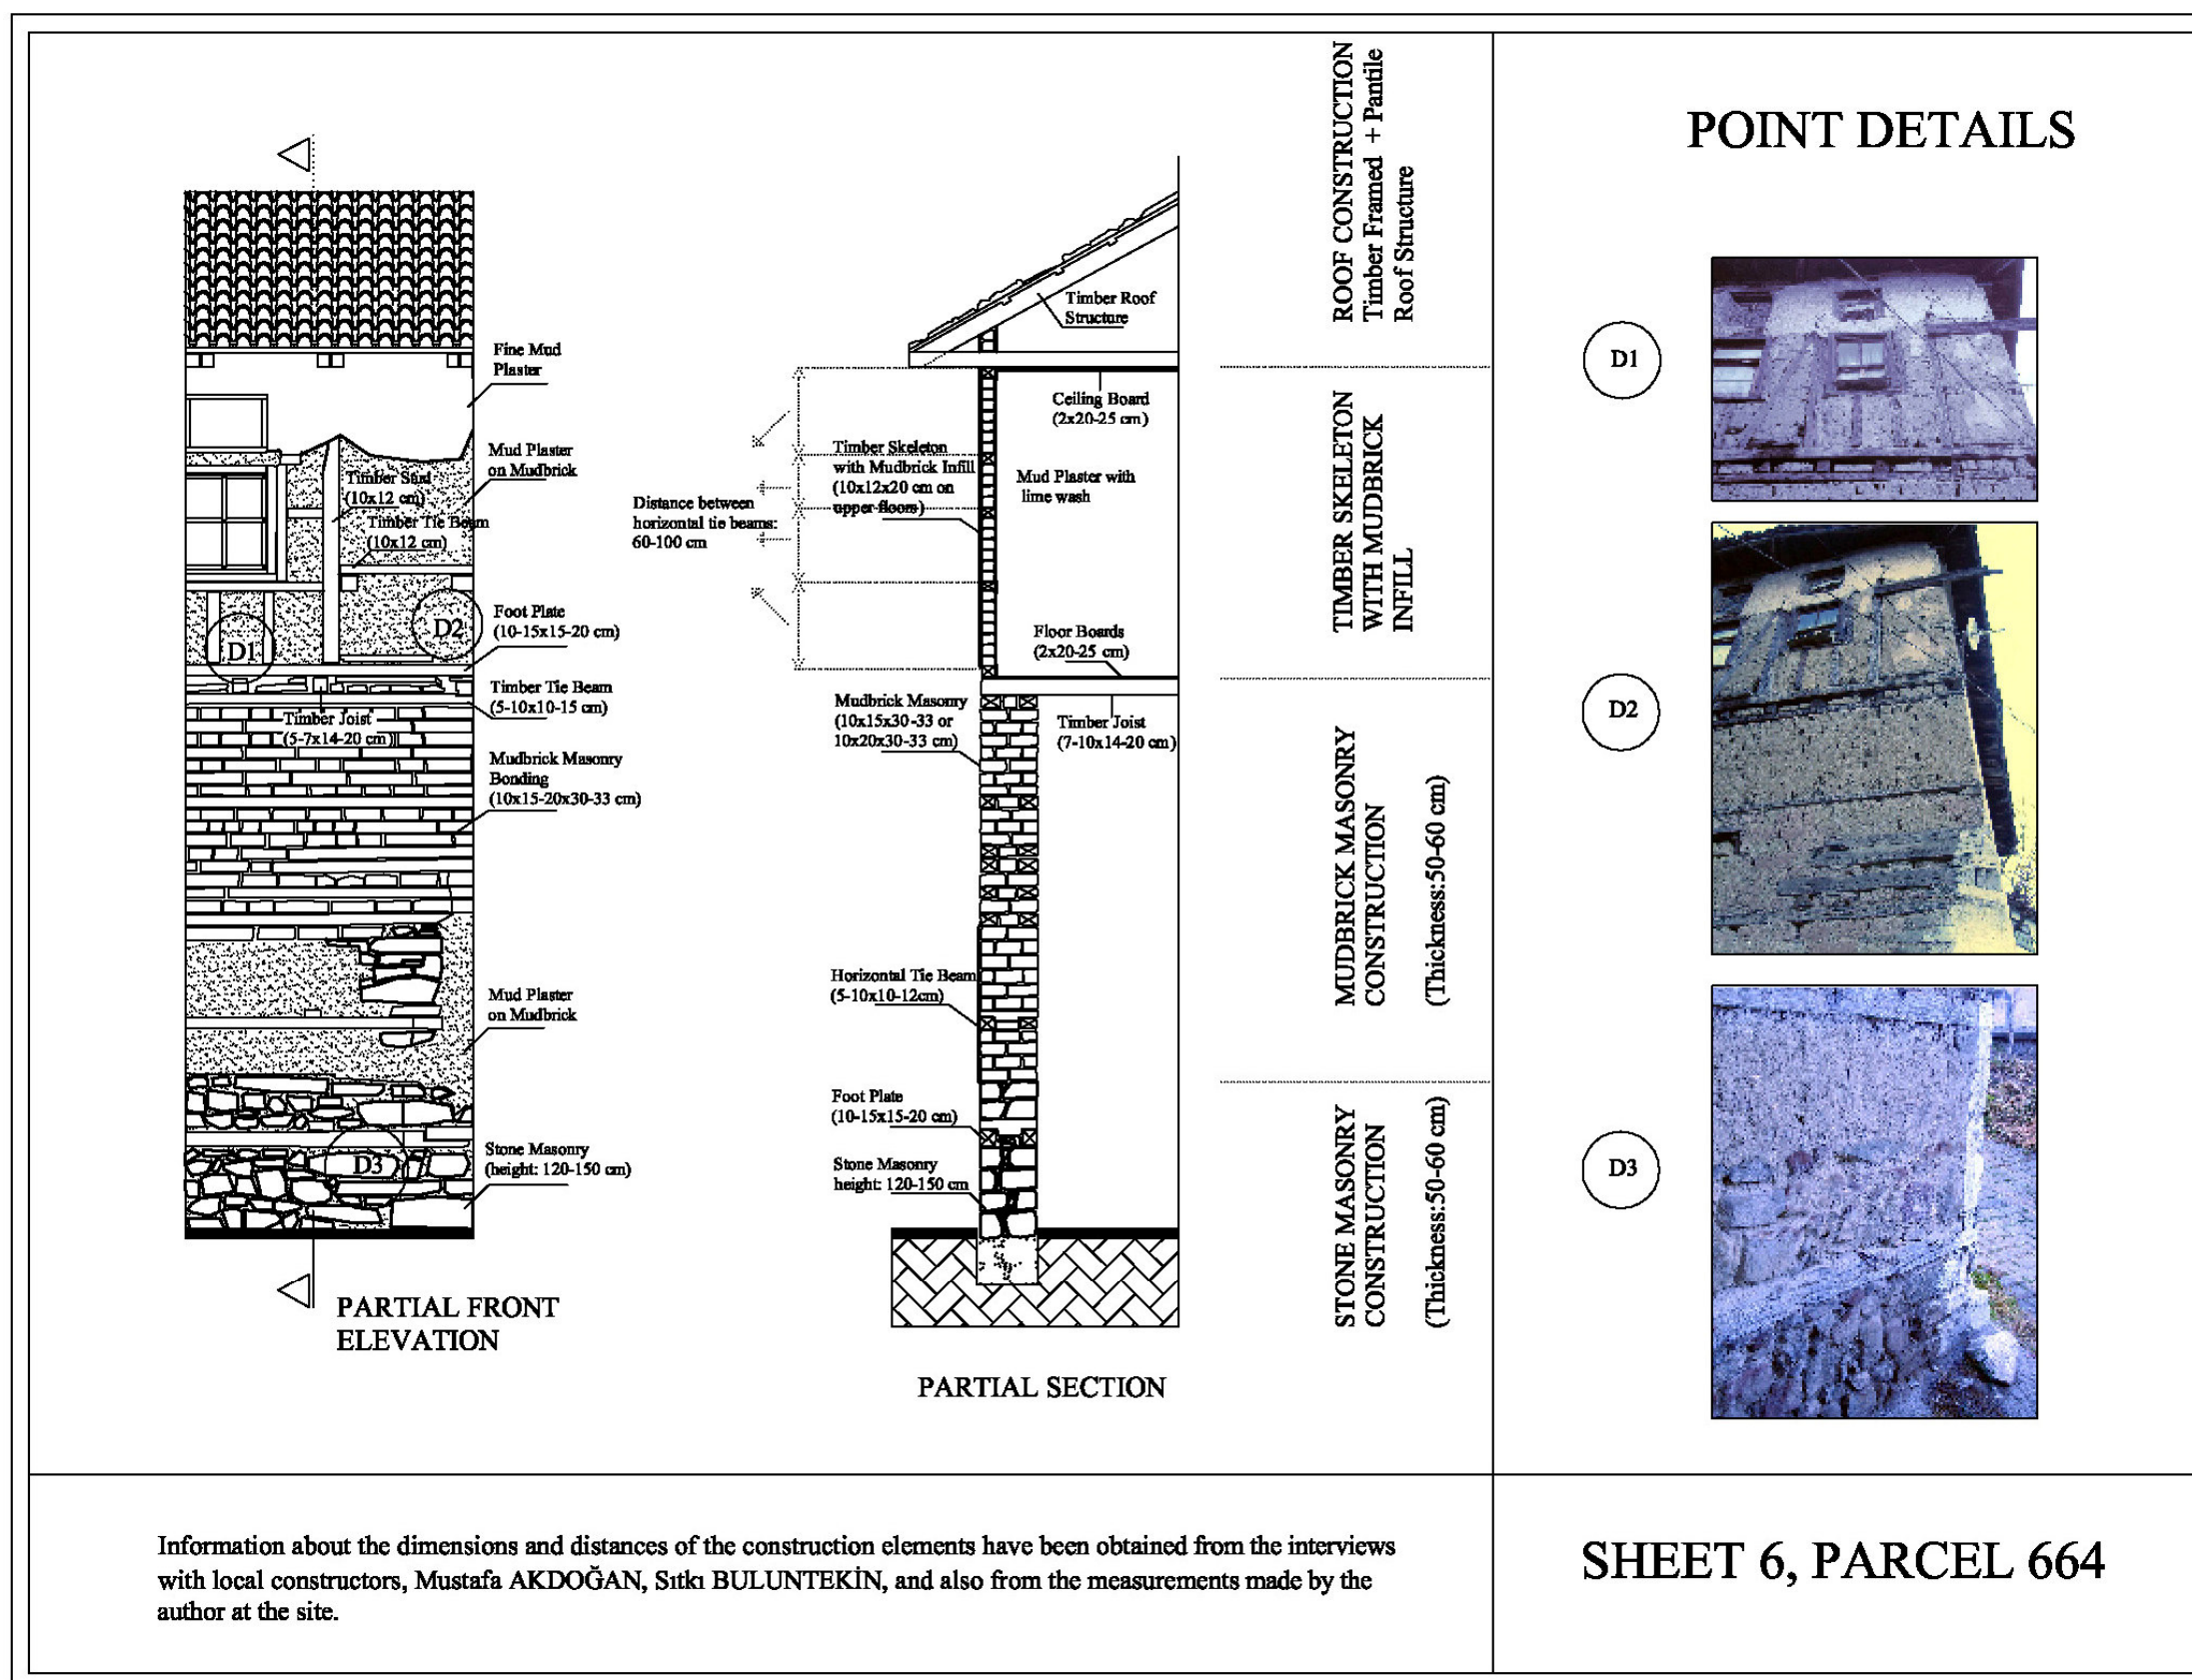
Construction Detail Drawings and Images of Çakırlar Konağı
